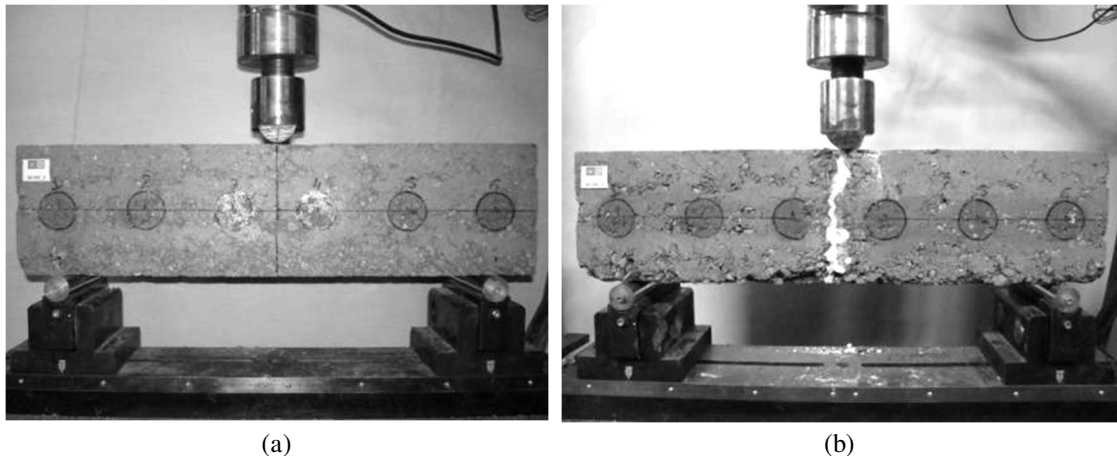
Test setup of the bending test carried out on the rammed earth medium-scale specimens (layers in the horizontal direction): (a) specimen before injection; (b) specimen after injection.
